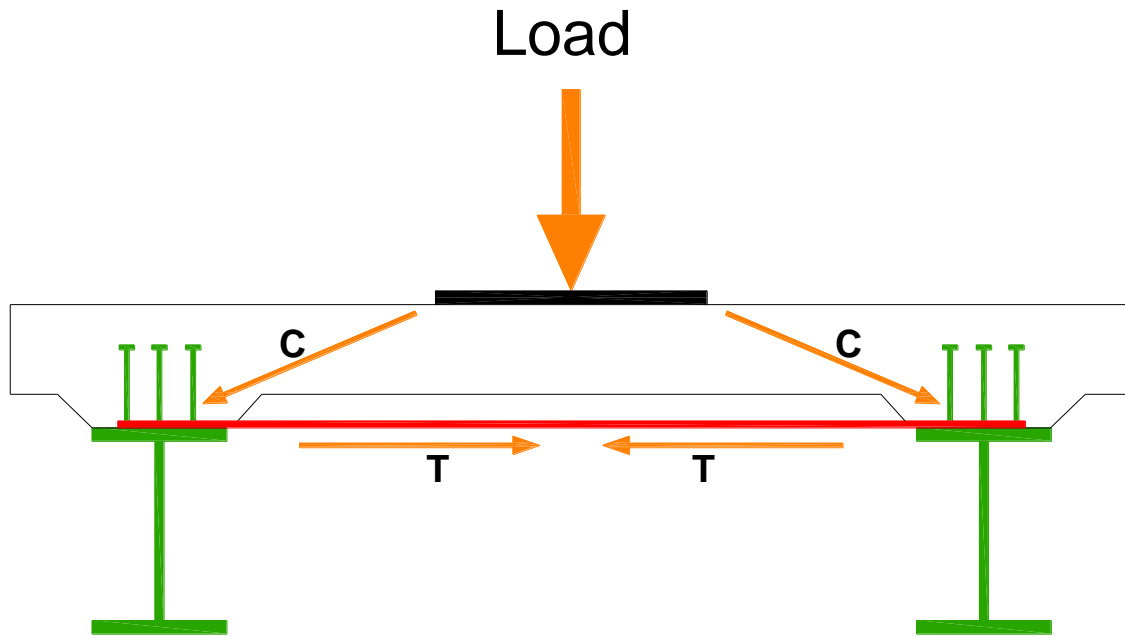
Arching action in a steel-free bridge deck slab under concentrated load
